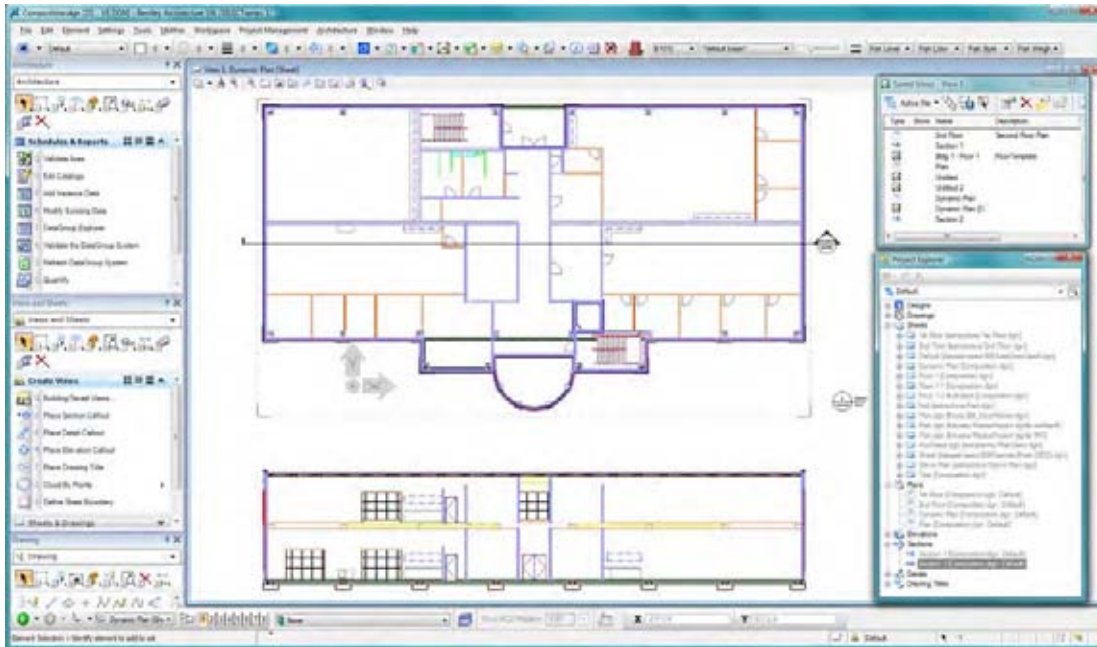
Creating a section from a plan view in Bentley Architecture and placing it on the same sheet.
